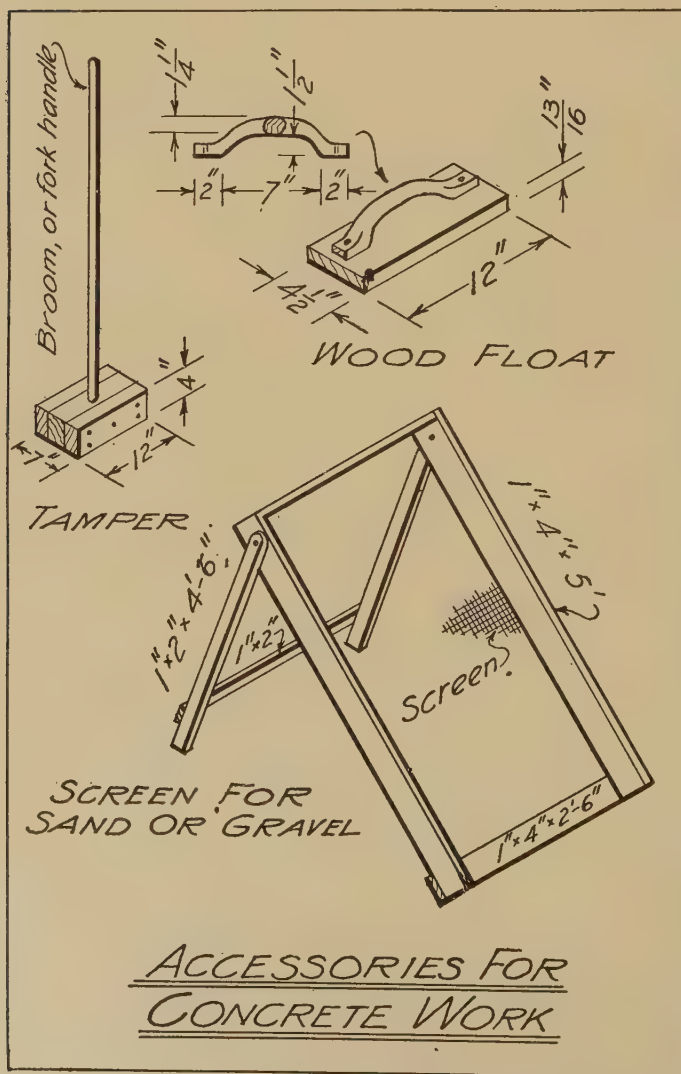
ACCESSORIES FOR CONCRETE WORK
